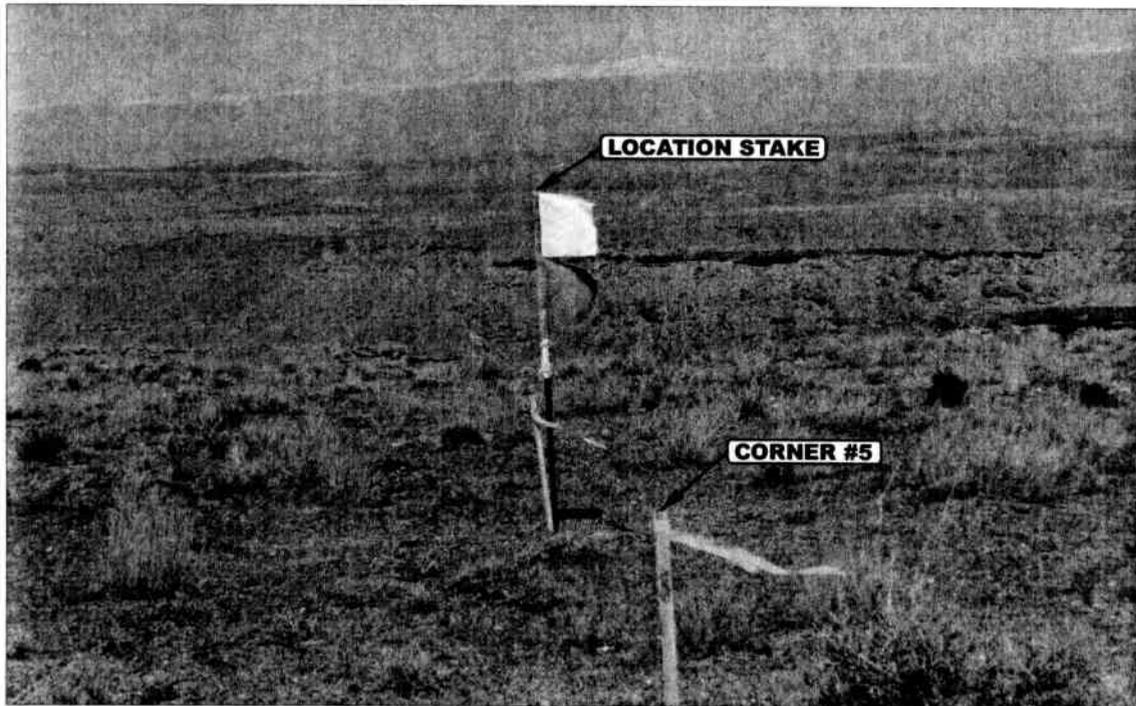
PHOTO: VIEW FROM LOCATION STAKE TO CORNER #5
